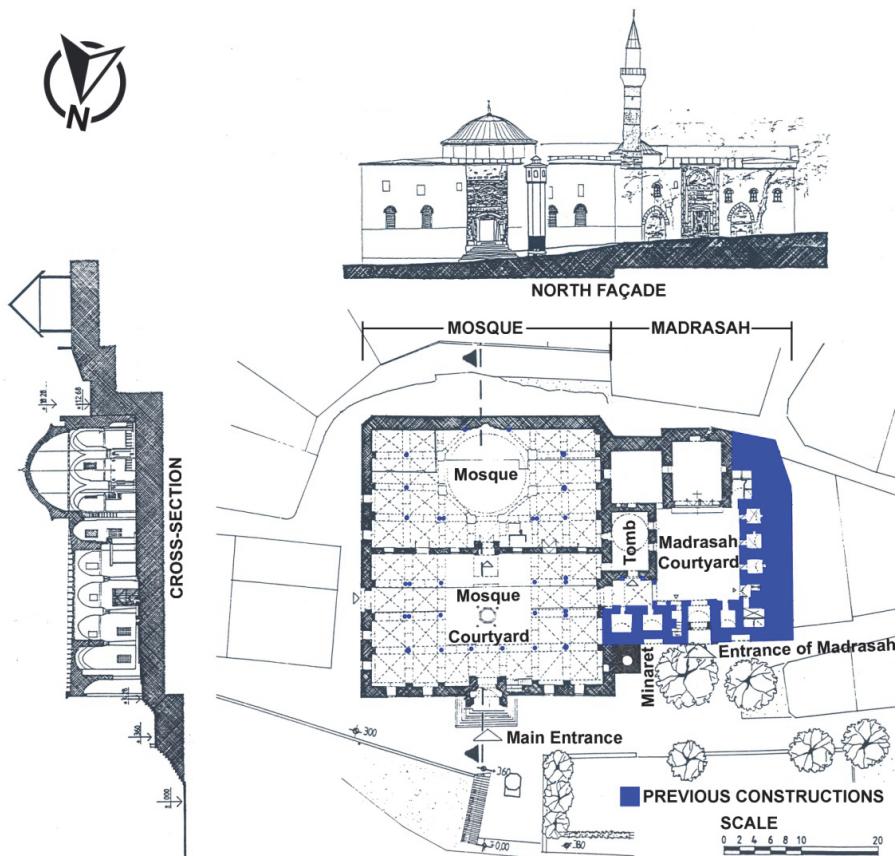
Plan, Cross-section and Façade of the Manisa Grand Mosque Complex (D.E.U., 1996)
